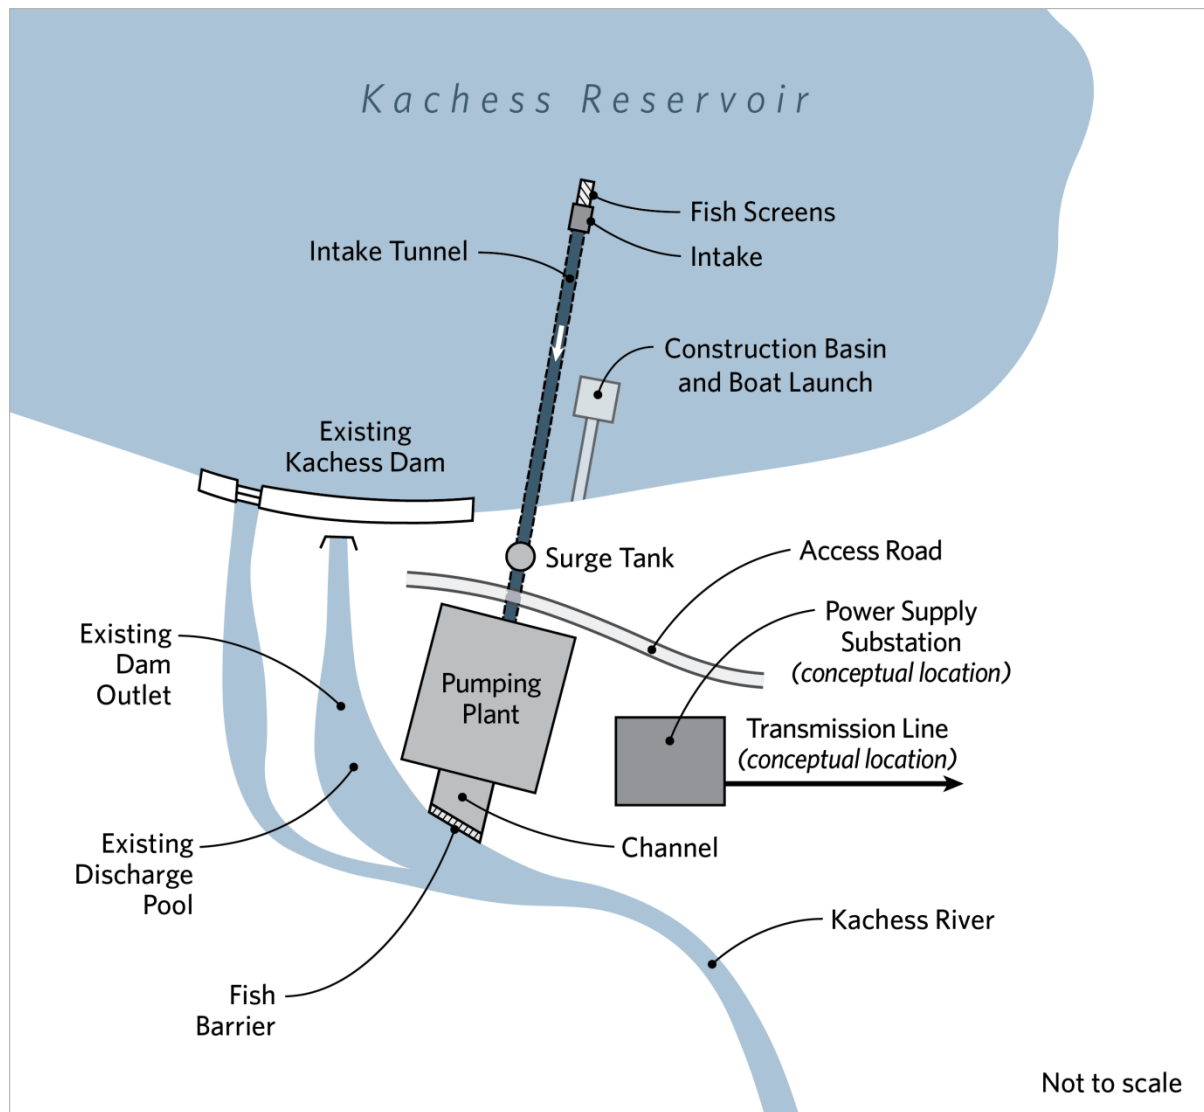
KDRPP South Pumping Plant Conceptual Site Plan
